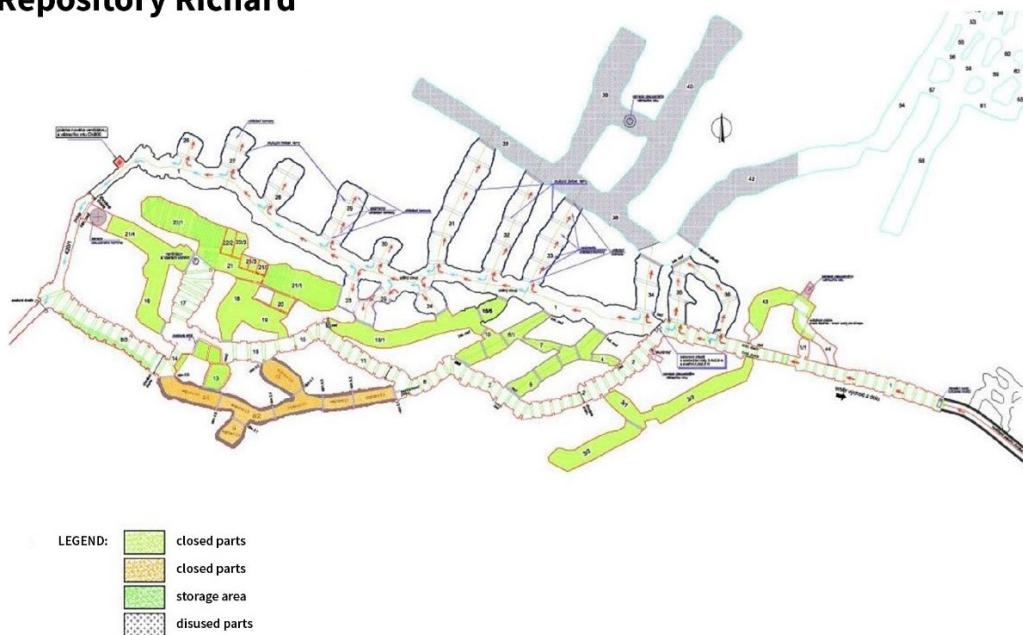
Layout of the underground complex of the Richard repository following reconstruction
